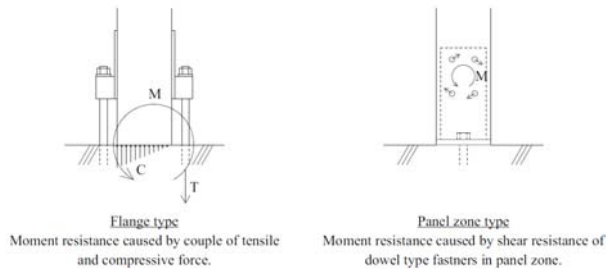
Rough classification of connecting systems used at the bottom of a column in a wall structure
